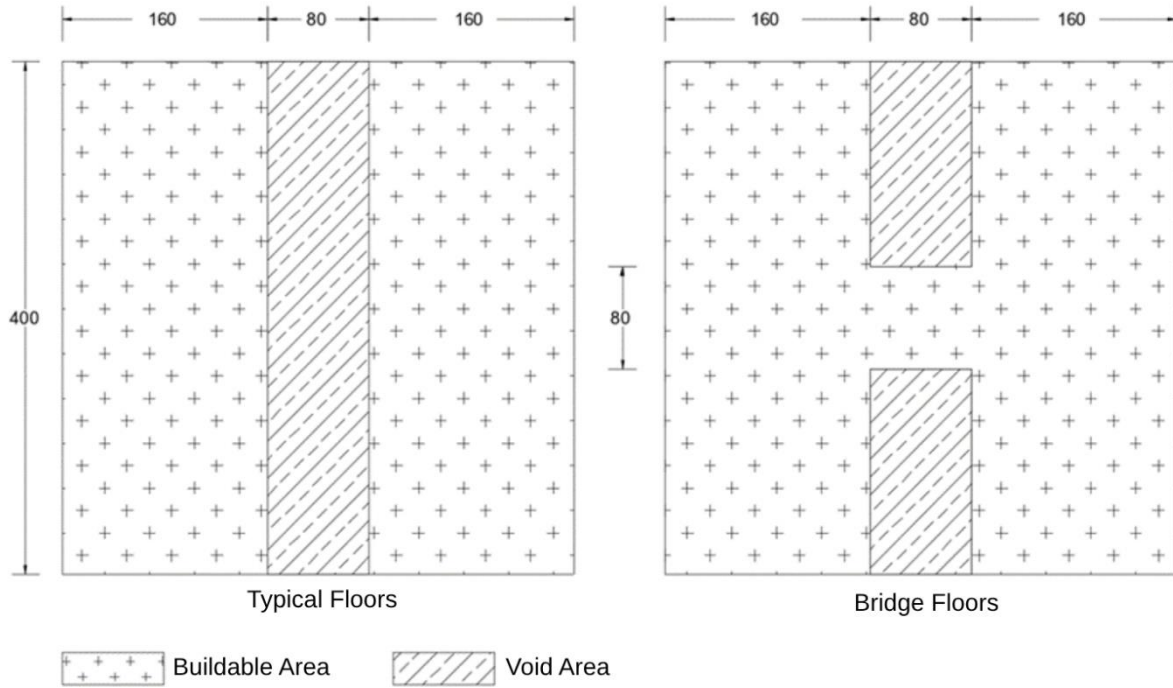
Typical Floor and Bridge-Connected Floor Plans
